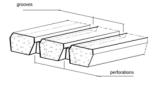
Typical dimension of a grooved floor system in concrete flooring. Such a system in cattle housing can help to reduce ammonia emssions from wastes. Diagram source:
